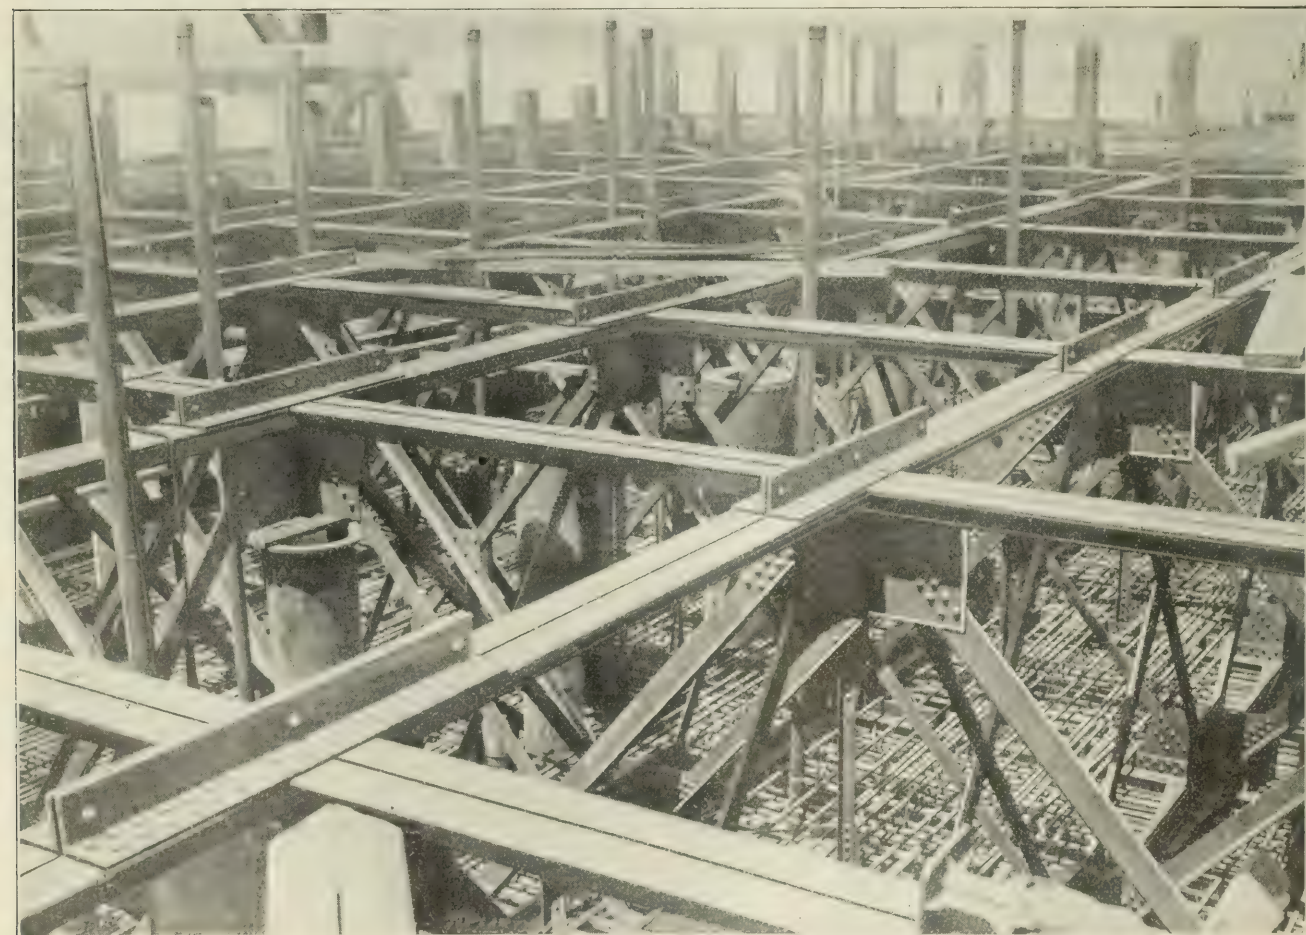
STEEL TRUSSES AND BOTTOM REINFORCEMENT IN THE ROOF OF THE WORKING CHAMBER
